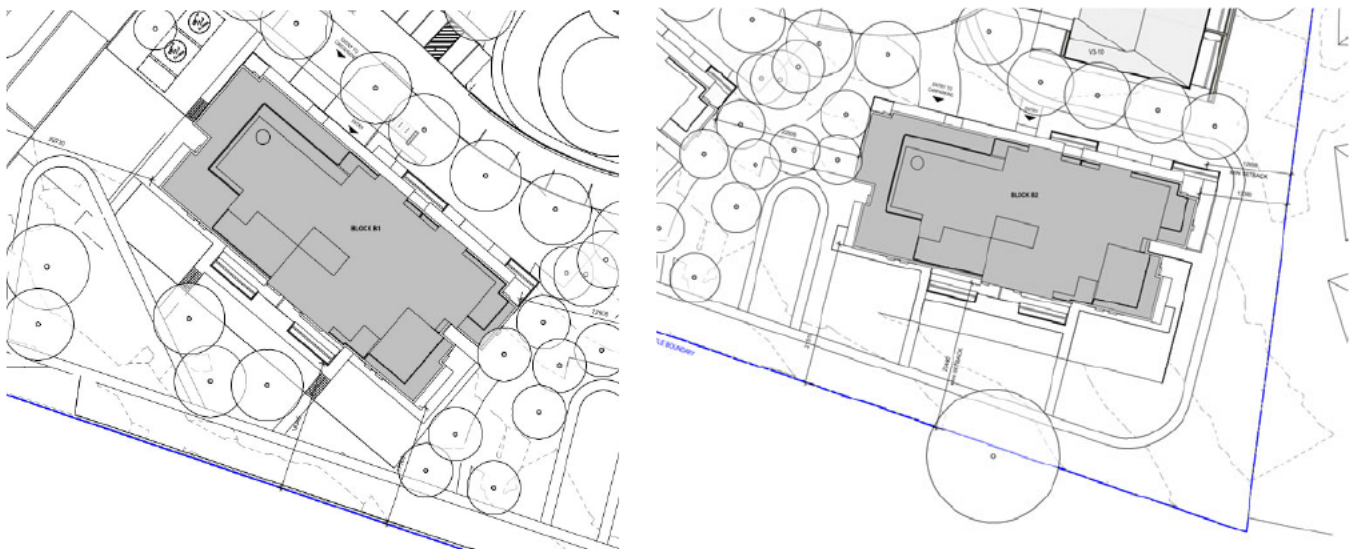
Siting of buildings B1 (left) and B2 (right) in context with the eastern and southern boundaries (Source: Development Plan, prepared by Thomson Adsett)
